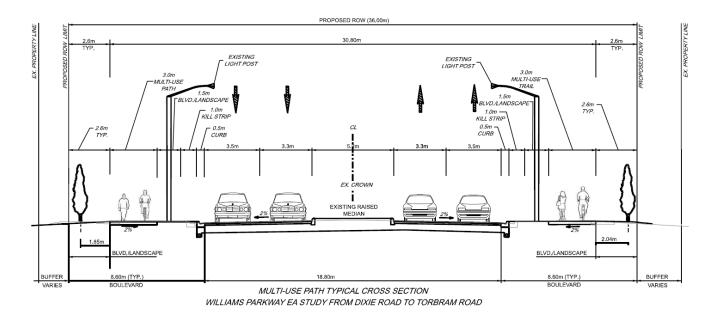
ALTERNATIVE DESIGN CONCEPT #1 - MULTI-USE PATH TYPICAL CROSS SECTION
